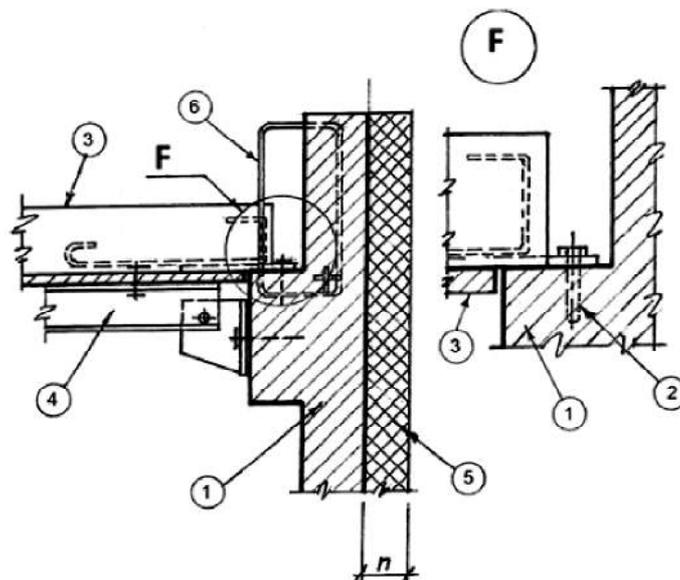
Support scheme of the panels of prefabricated precast concrete formwork on the external wall panel:
